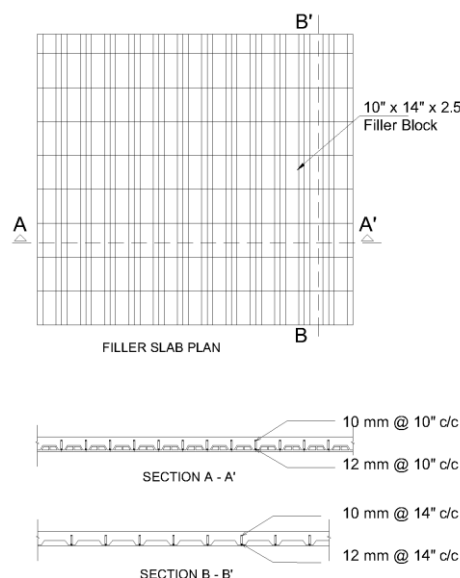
Typical plan and section of a filler slab with hollow filler clay block
